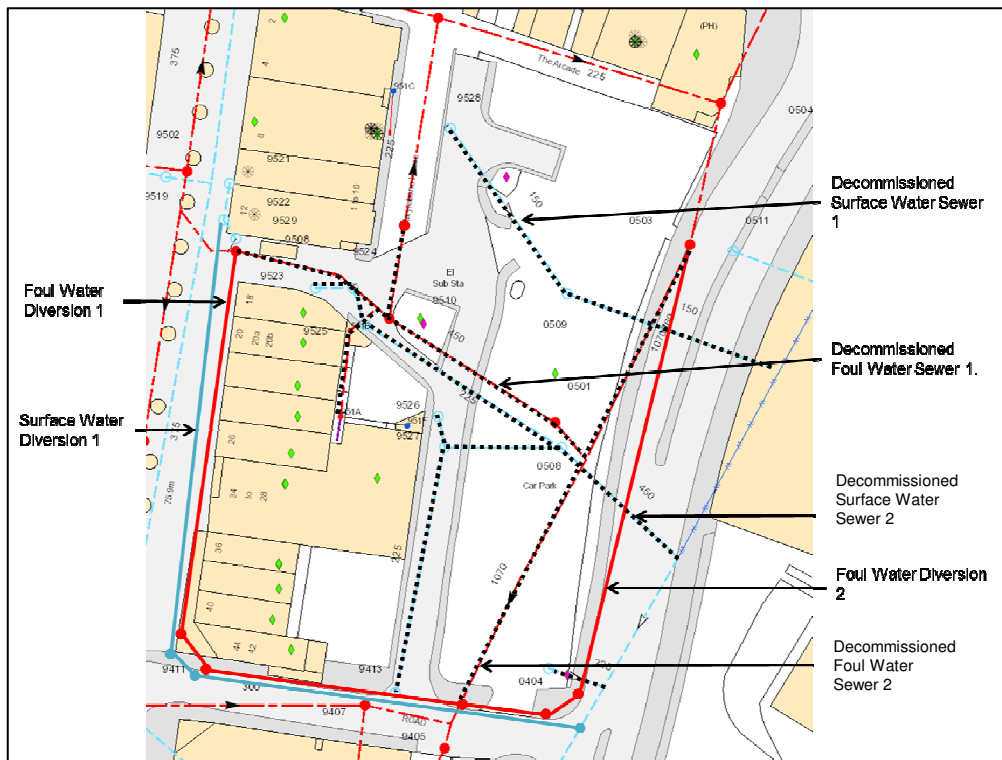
Sewers to be decommissioned and sewers to be diverted to allow for construction of the proposed development (red = foul sewer; blue = surface water sewer)
